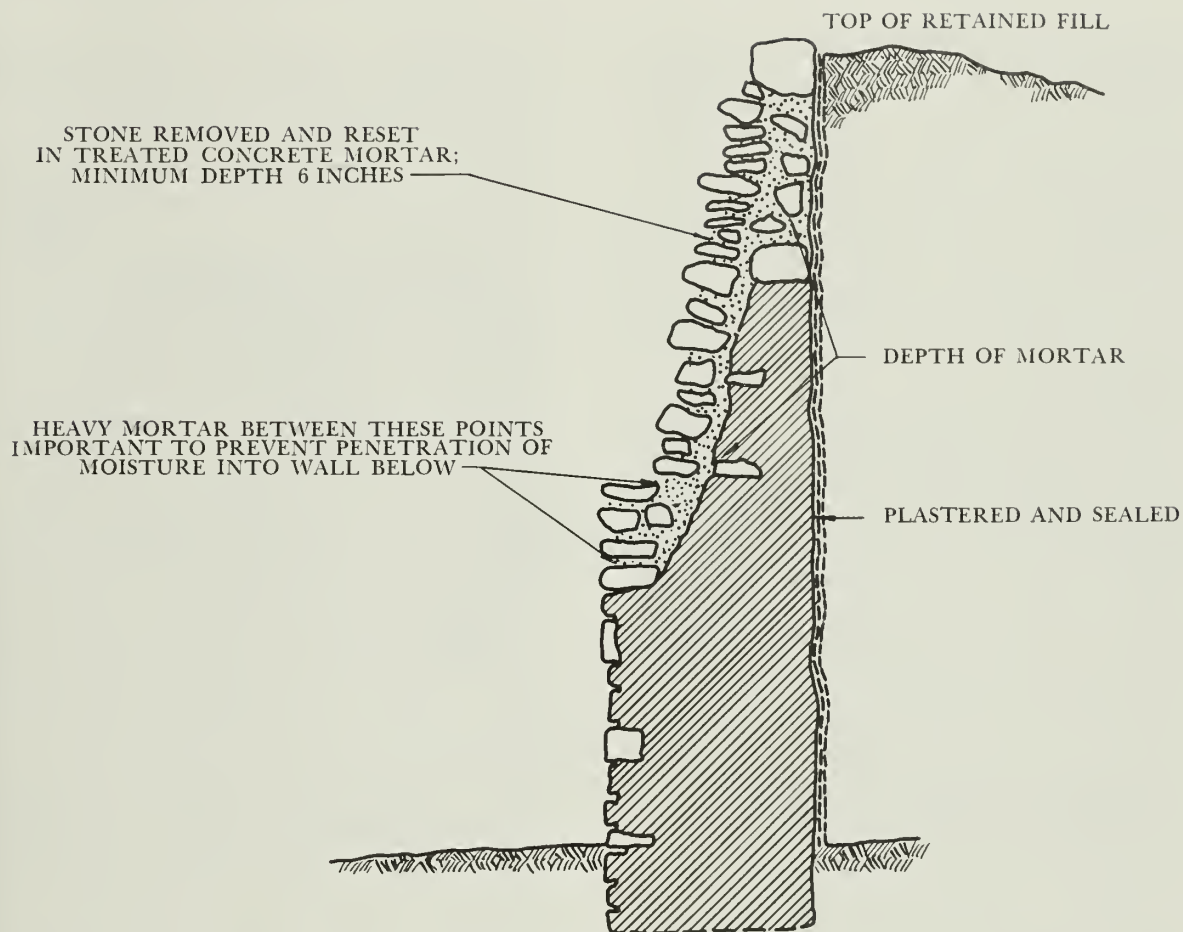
The application of waterproofed cement mortar to an oblique wall.
